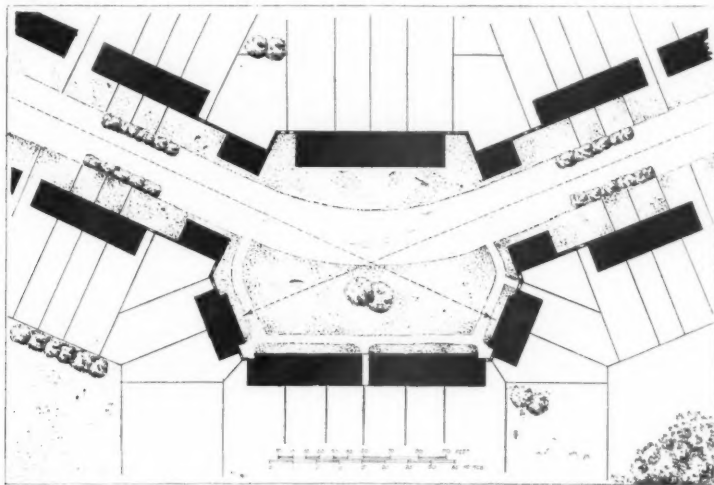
ARRANGEMENT FOR BEND IN A ROAD, WITH TERMINALS AND BUILDINGS DESIGNED TO FRAME AND DEFINE THE STREET PICTURES.
